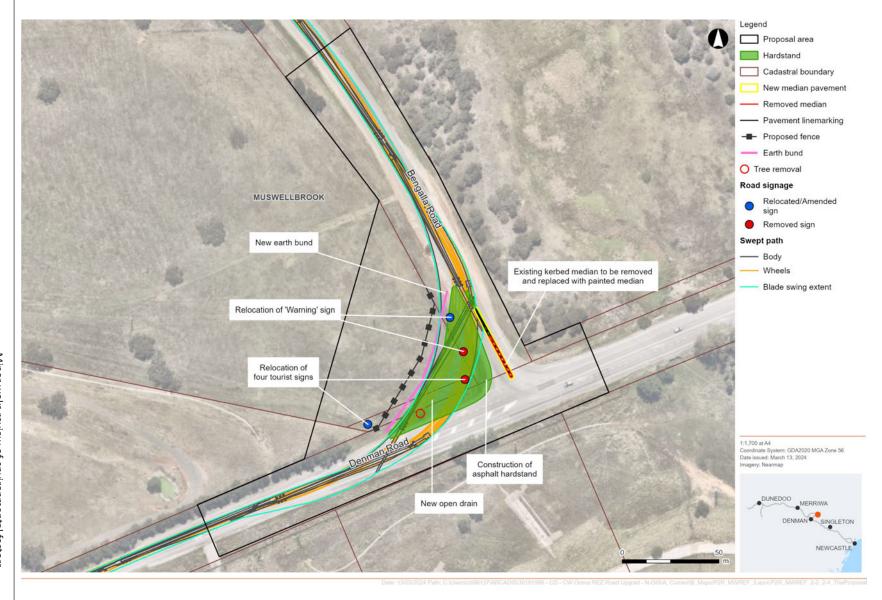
The proposal – Denman Road and Bengalla Road intersection, Muswellbrook (I-026)
